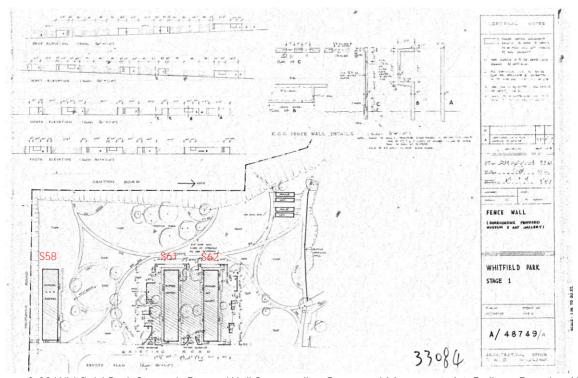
Whitfield Park Stage 1, Fence Wall Surrounding Proposed Museum & Art Gallery, Drawing No. A/48749/a, first issued in 1969, revision A issued on unknown date. (Source: Architectural Services Department, Microfilm No. 33084)
